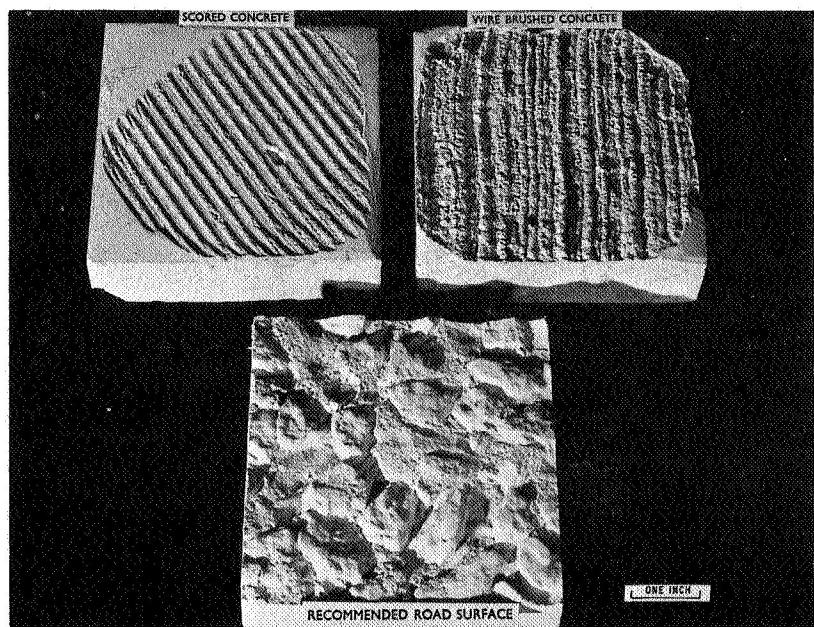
Plaster casts of two concrete runway surfaces and a recommended road surface.
